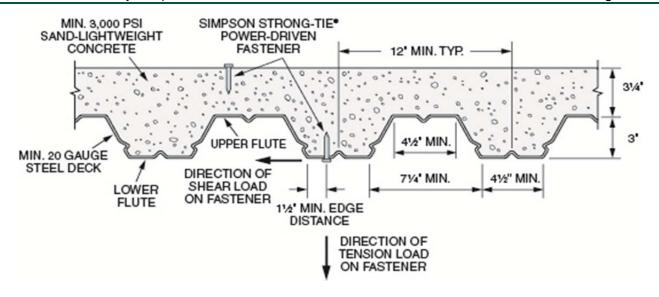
INSTALLATION IN 31/4-INCH CONCRETE FILL OVER 3-INCH-DEEP STEEL DECK
